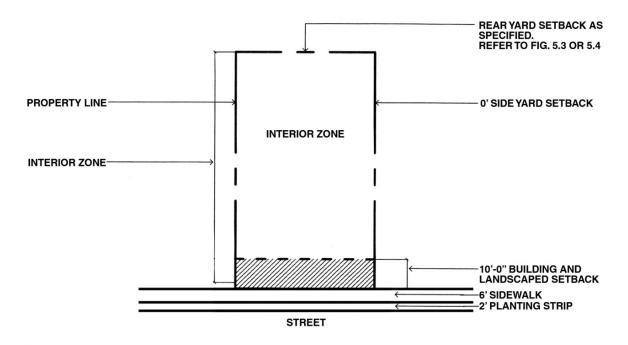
Typical Lot Diagram (Building Setbacks)
